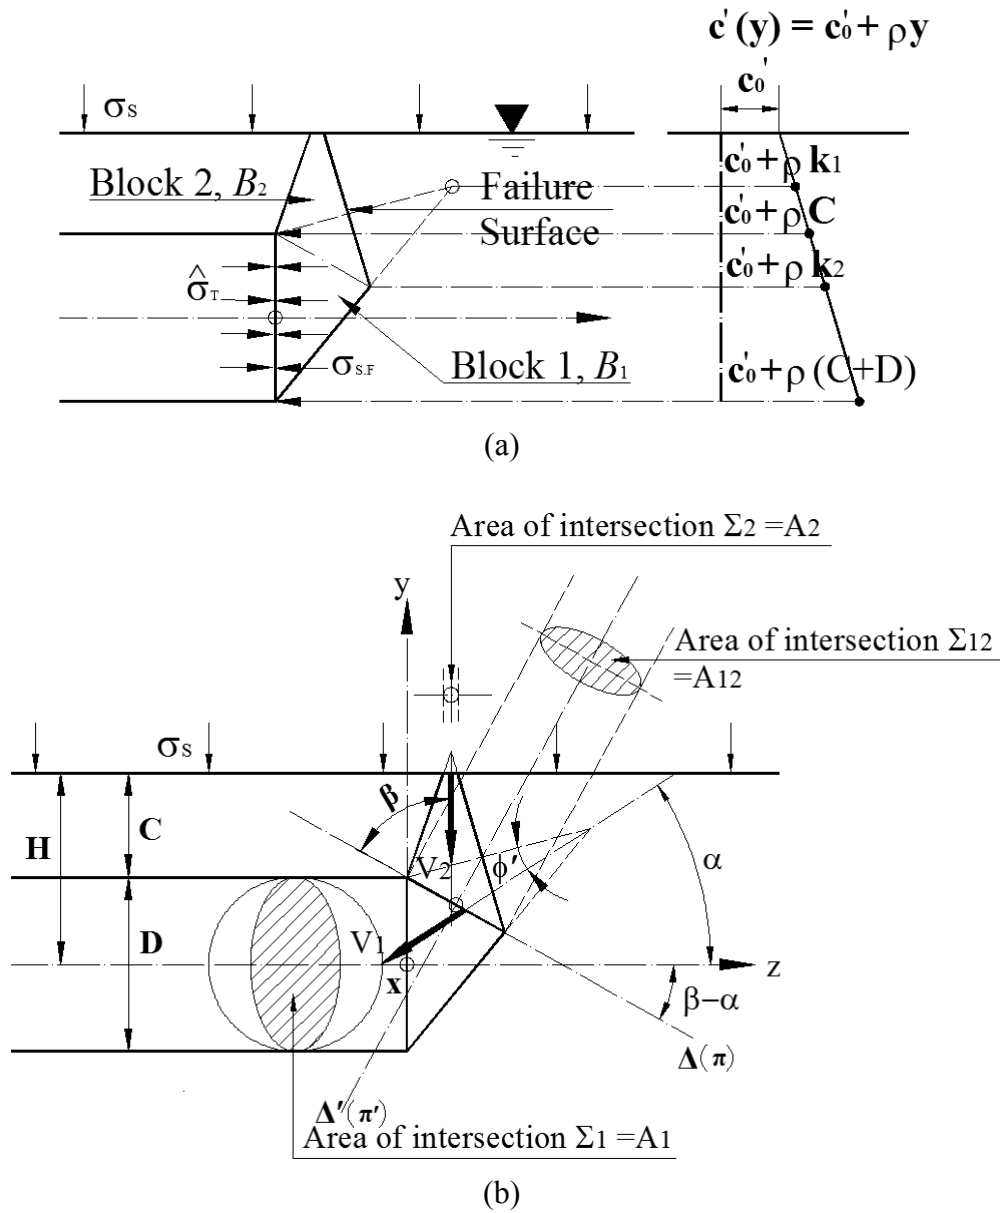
Collapse mechanism of tunnel face by the two conical blocks
